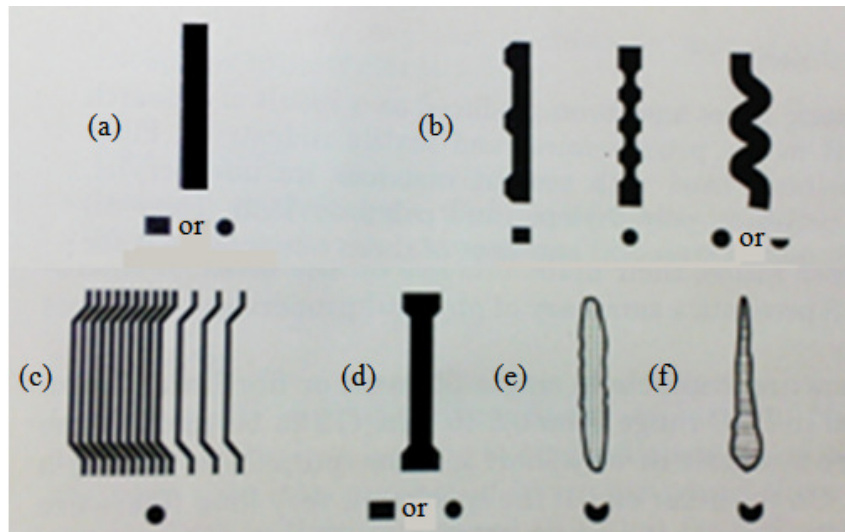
Various shapes of steel fibers used in fiber-reinforced concrete. (a) Straight slit sheet or wire (b) Deformed slit sheet or wire (c) Crimped-end wire (d) Flattened-end slit sheet or wire (e) Machines chip (f) Melt extract [3]
